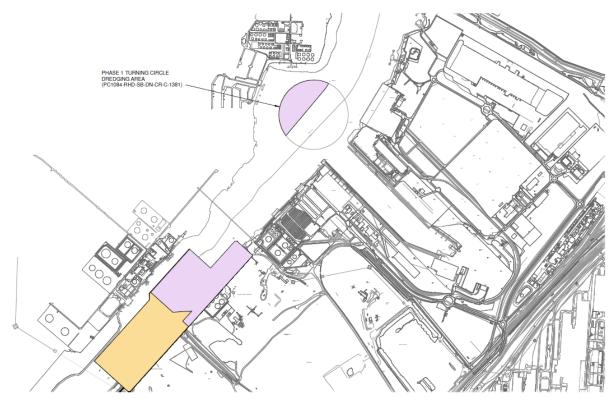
Overview site plan of South Bank development on the River Tees (NTS)
